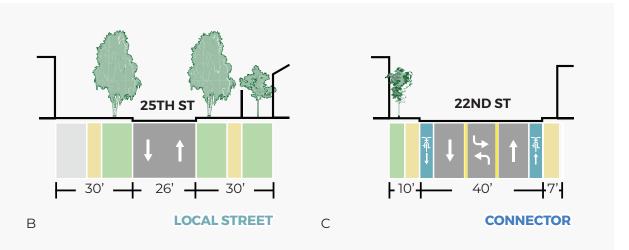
CLASSIFICATION IN CITY'S COMPLETE STREET PLAN FIGURE 2-42: TYPICAL STREET SECTIONS (VIEW FROM SOUTH TO NORTH)
